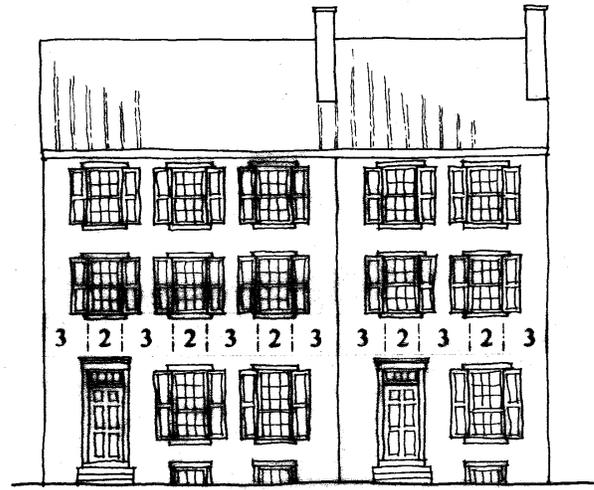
The spacing of window and wall on a façade creates a rhythm that repeats itself from building to building. The spacing of buildings along a street also creates a rhythm.
